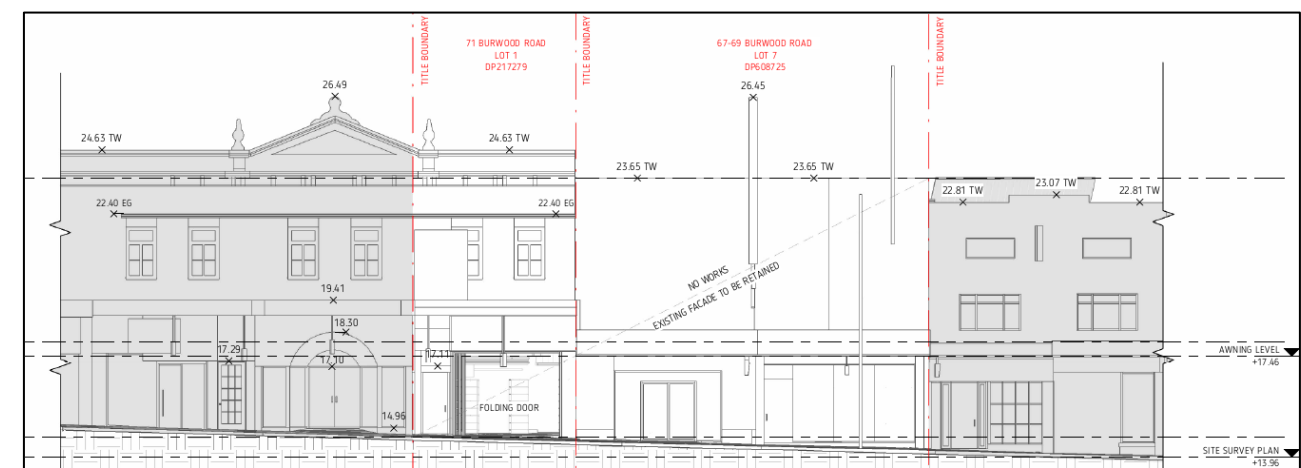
Extract of applicant's proposed Burwood Street elevation.
